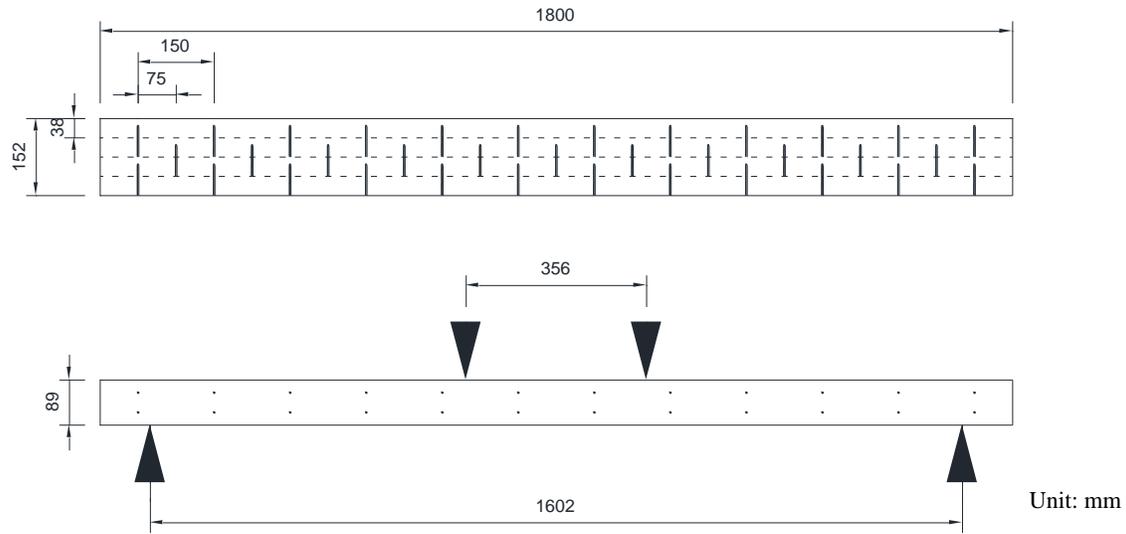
The test method of wooden nail welding laminated timber and its bending resistance
